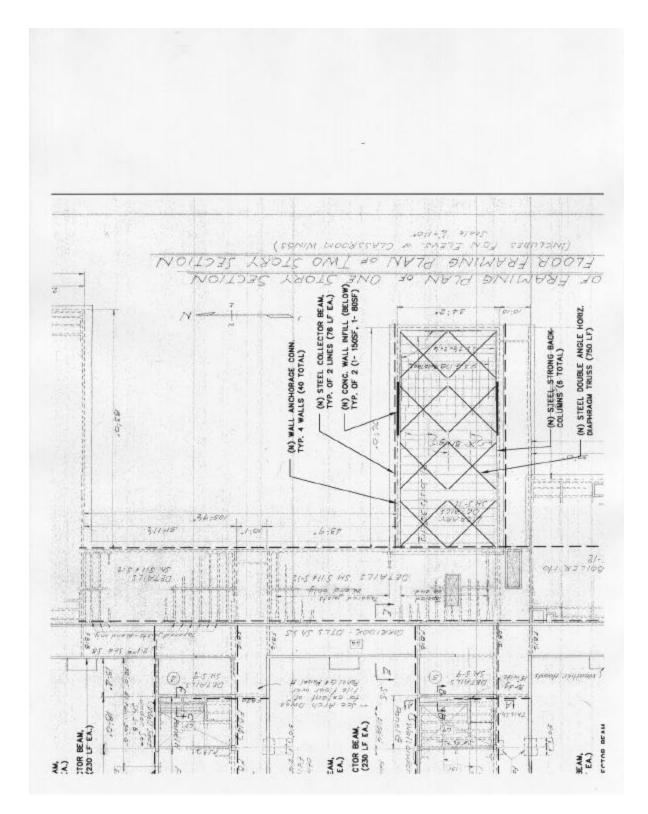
Main Building, Wing 3 & 4 Floor Framing Plan
